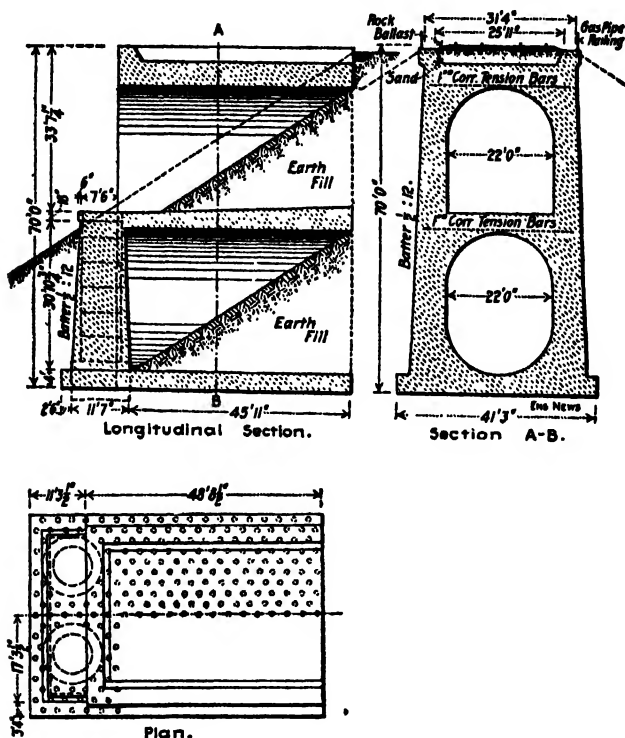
Reinforced-Concrete Arch Abutment.
